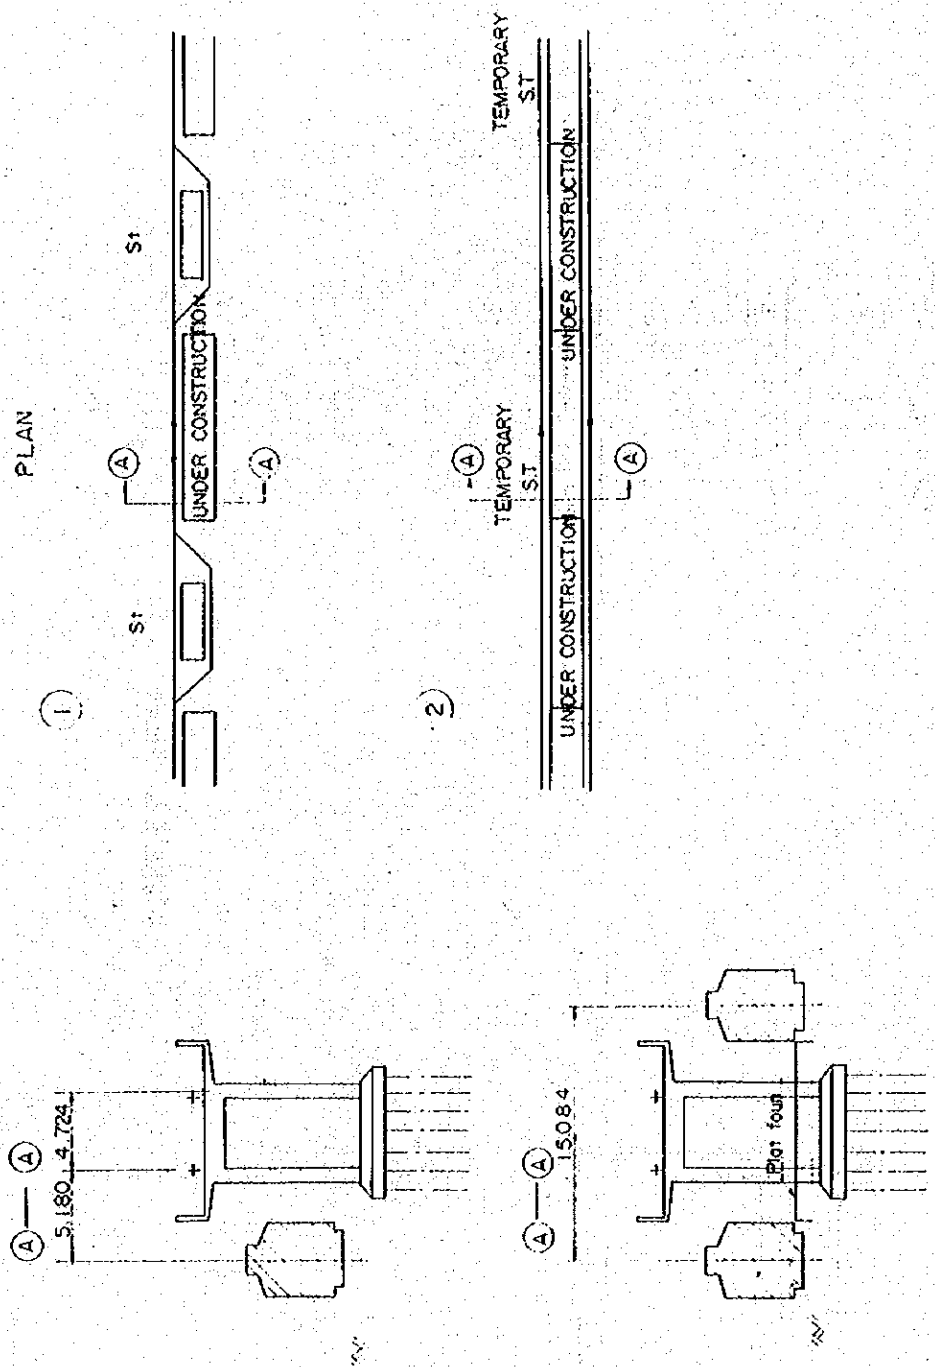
(b) Execution Process of Elevated Railway
